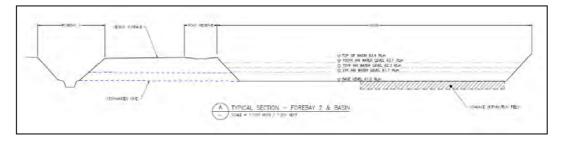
Section Through the Stormwater Forebays and Soakage Basin
